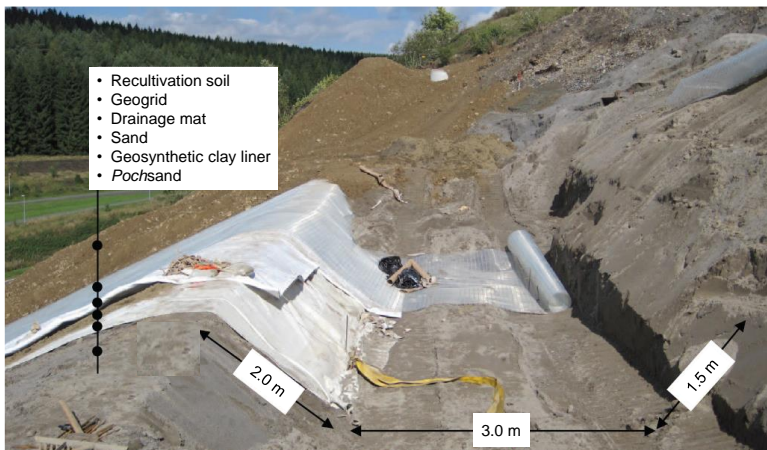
Construction of geogrid anchorage trench of surface slope at the disposal Pochsandhalde in Germany, instrumented with strain gauges (after Haaszio et al., 2011).
